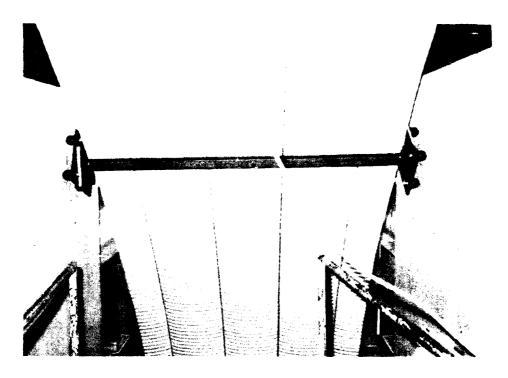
Roller plate and T-sections to prevent side sway and reduce load deformations of the free edge in the full arch tests.
